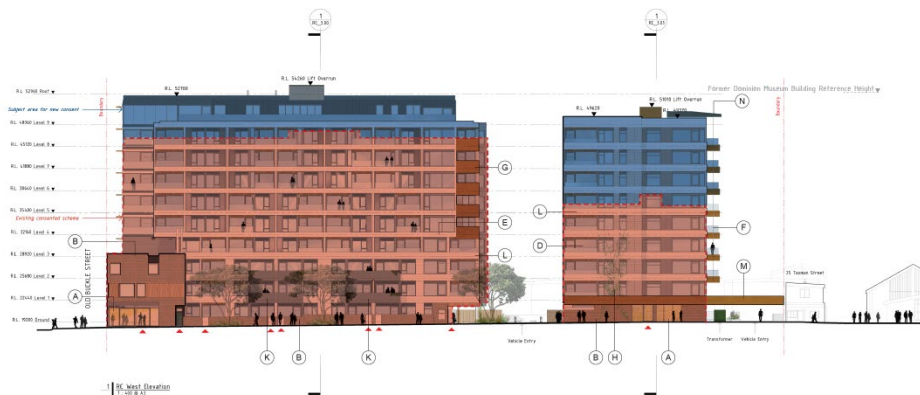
WEST ELEVATION OF THE PROPOSED DESIGN SHOWING SCALE OF CONSENTED BUILDING AS BRICK RED AND OF PROPOSED BUILDING AS BLUE (FROM AEE-APPENDIX-3---CONSENT-SCOPE-DIAGRAMS,PDF)
